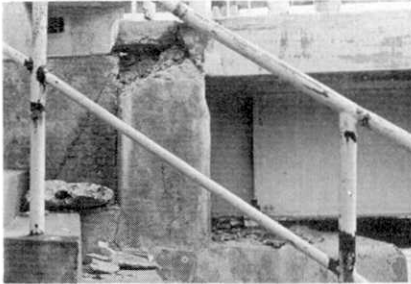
Damage from the collision between a bridge floor and its abutment.
